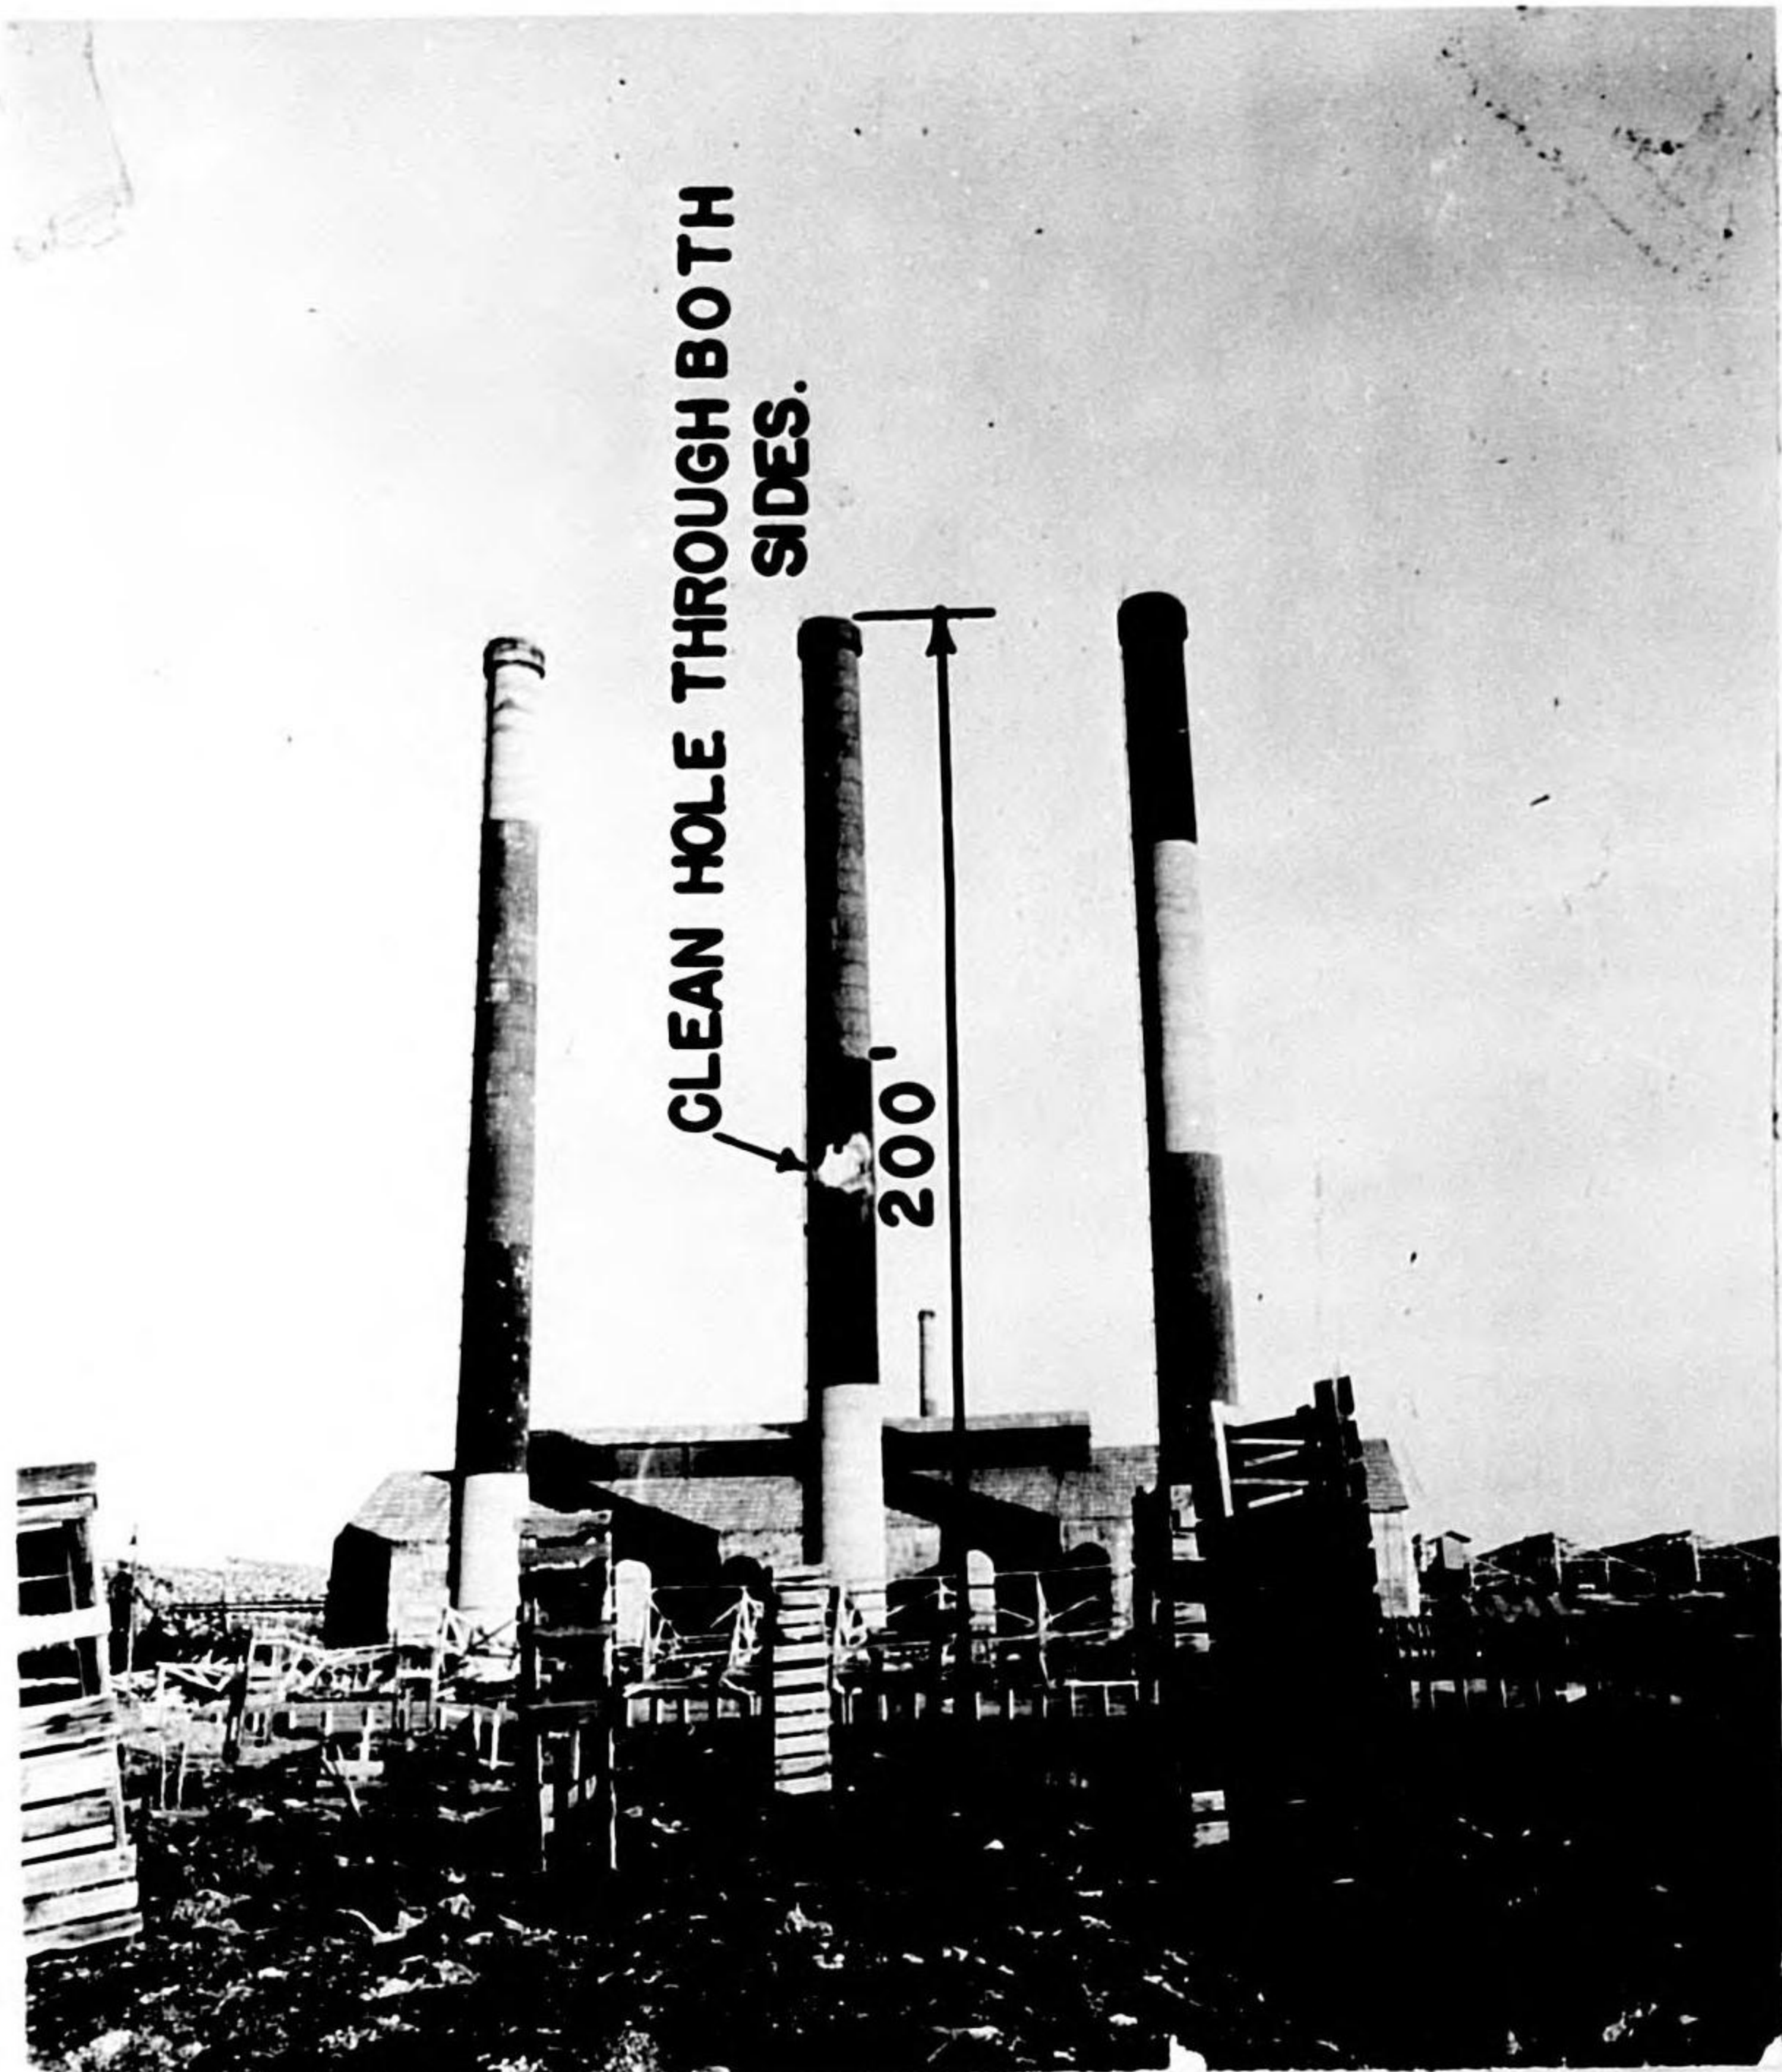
Upper perforation of reinforced-concrete stacks looking east.
